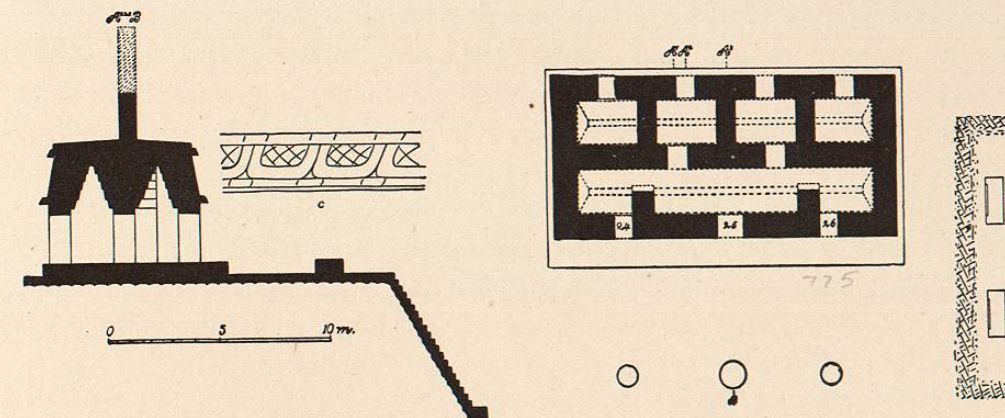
STRUCTURE 23: SECTION AND GROUND-PLAN (RESTORED).
